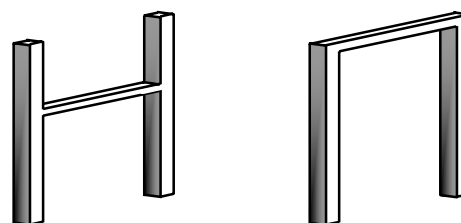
H-Type Tower Fig.4: Gate-Type Tower
